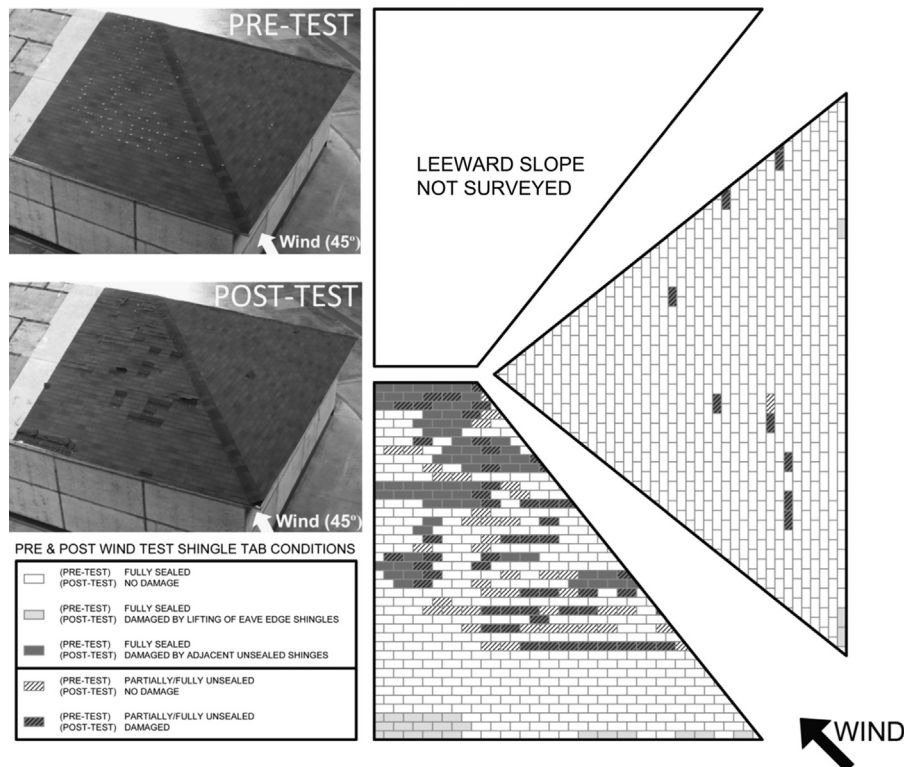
Hip roof three-tab shingle specimen pre- and post-test conditions with pre-wind test unsealed shingles denoted by tape in the top left photo and the post-test condition summarized in the roof plan at right.
